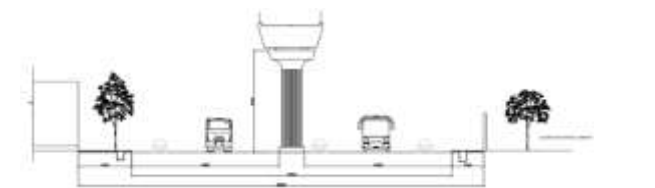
Street section across Rashtreeya Vidyalaya road (DD')
